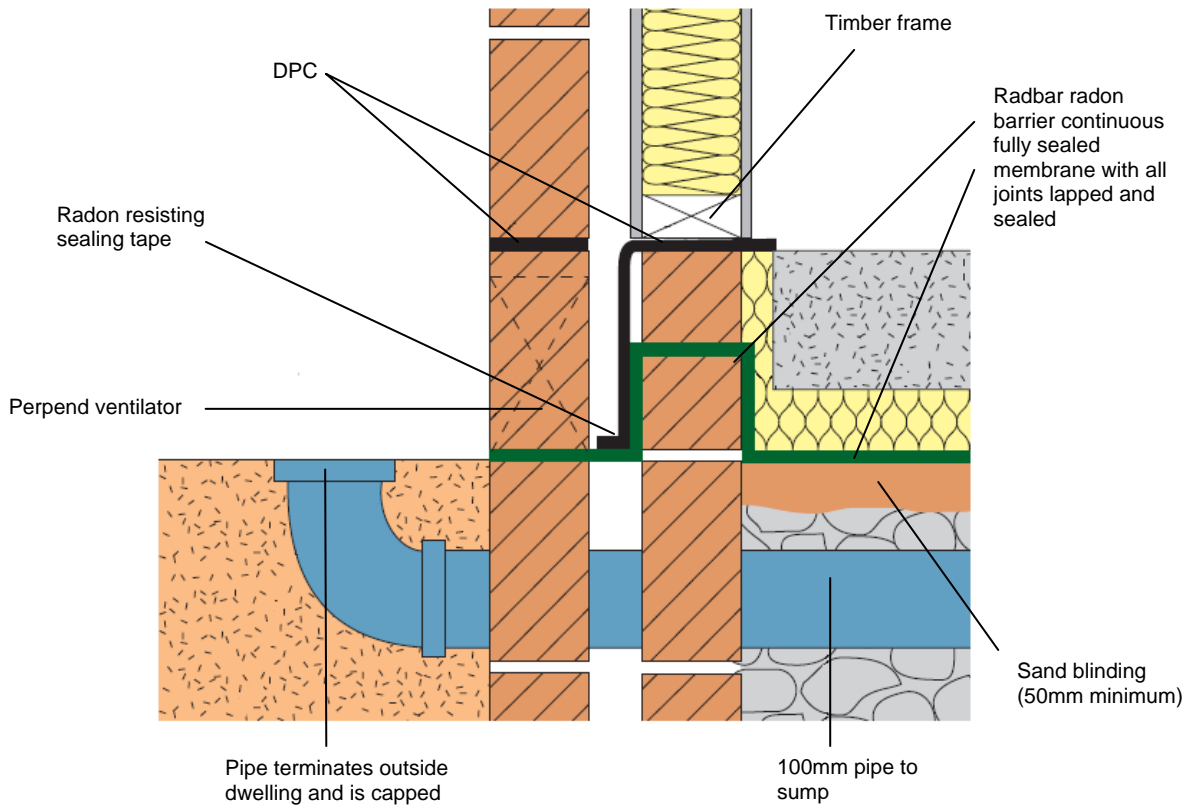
Detail showing Radbar with folds under floating slab floor
